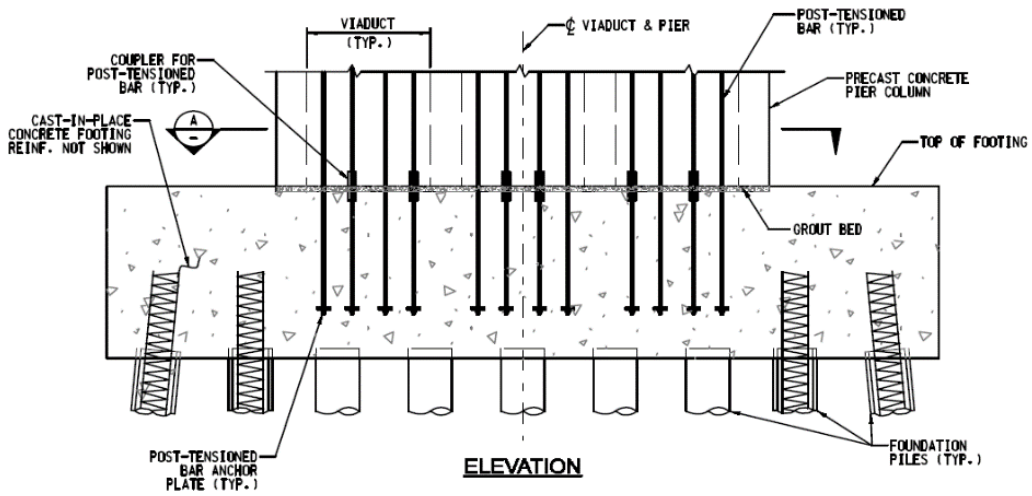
Precast concrete pier-to-footing detail in Cross Westchester Expressway Viaduct (FHWA 2009)
